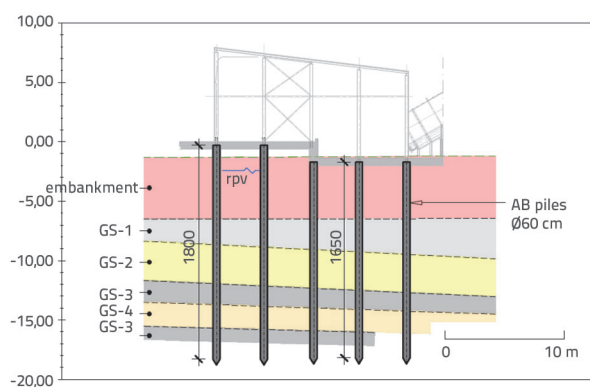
Characteristic cross-section of the structure and piles, and geotechnical soil profile (TRANSSHIPMENT STATION)
